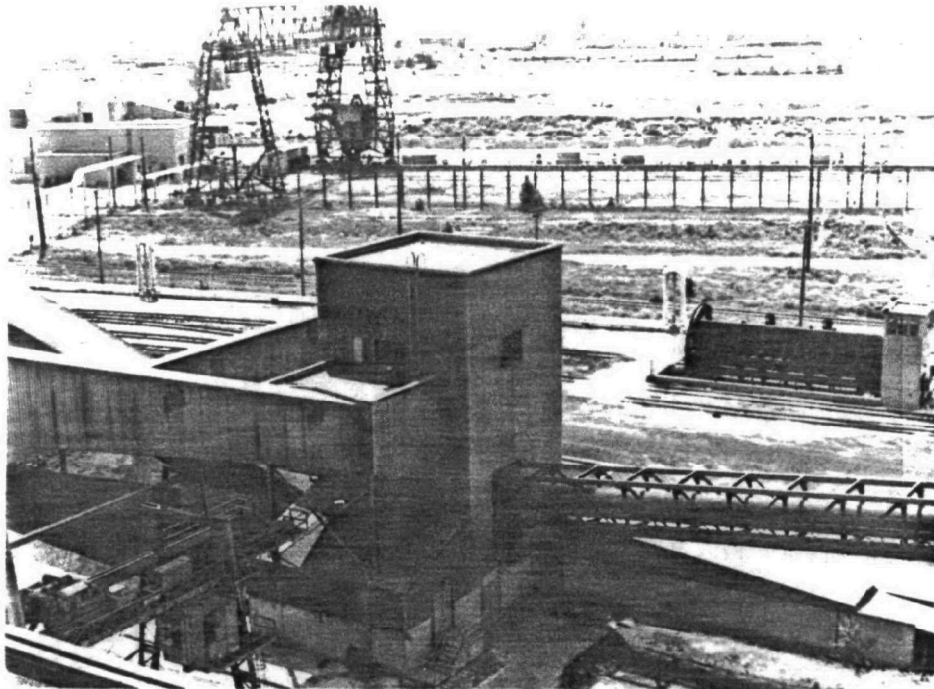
View from the roof of Boiler 5 facing southeast. The coal junction house is shown in the center of the photo. The gantry crane is shown in the upper left hand corner. The coal car dumper is shown in the right center of the photograph.
